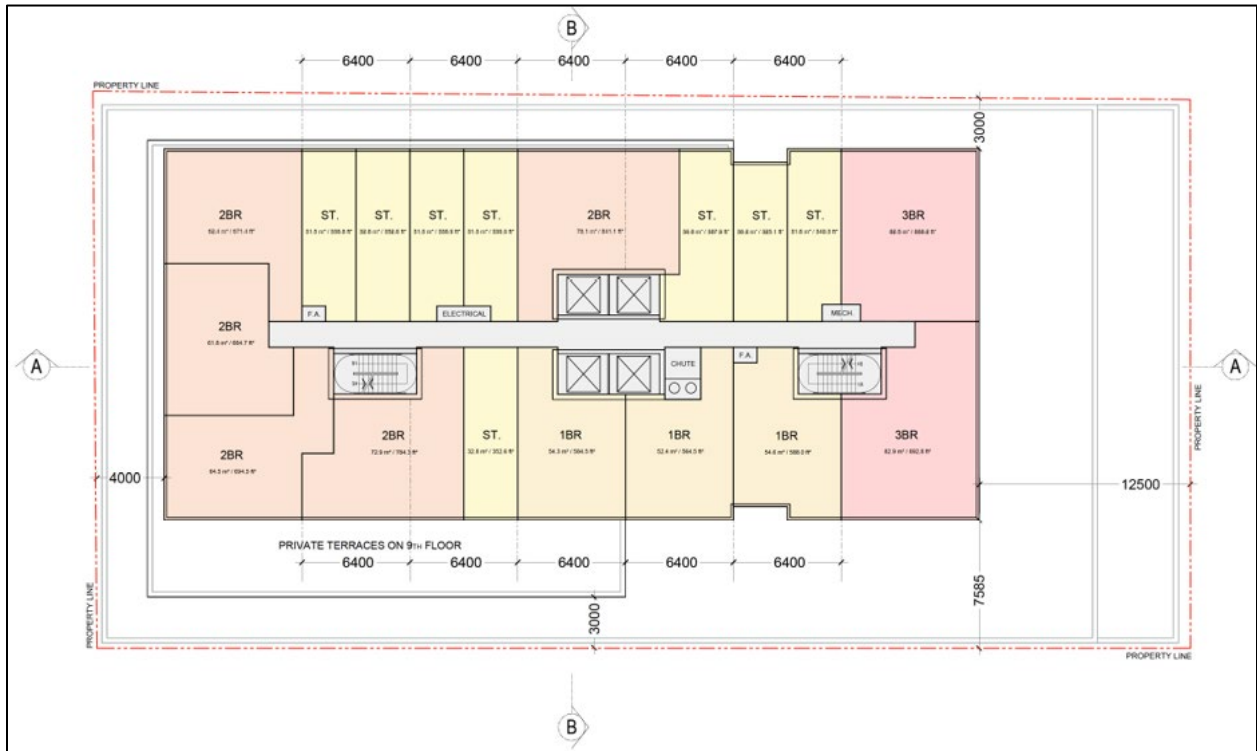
9th to 23rd Floor Plan (Source: Hariri Pontarini Architects)
